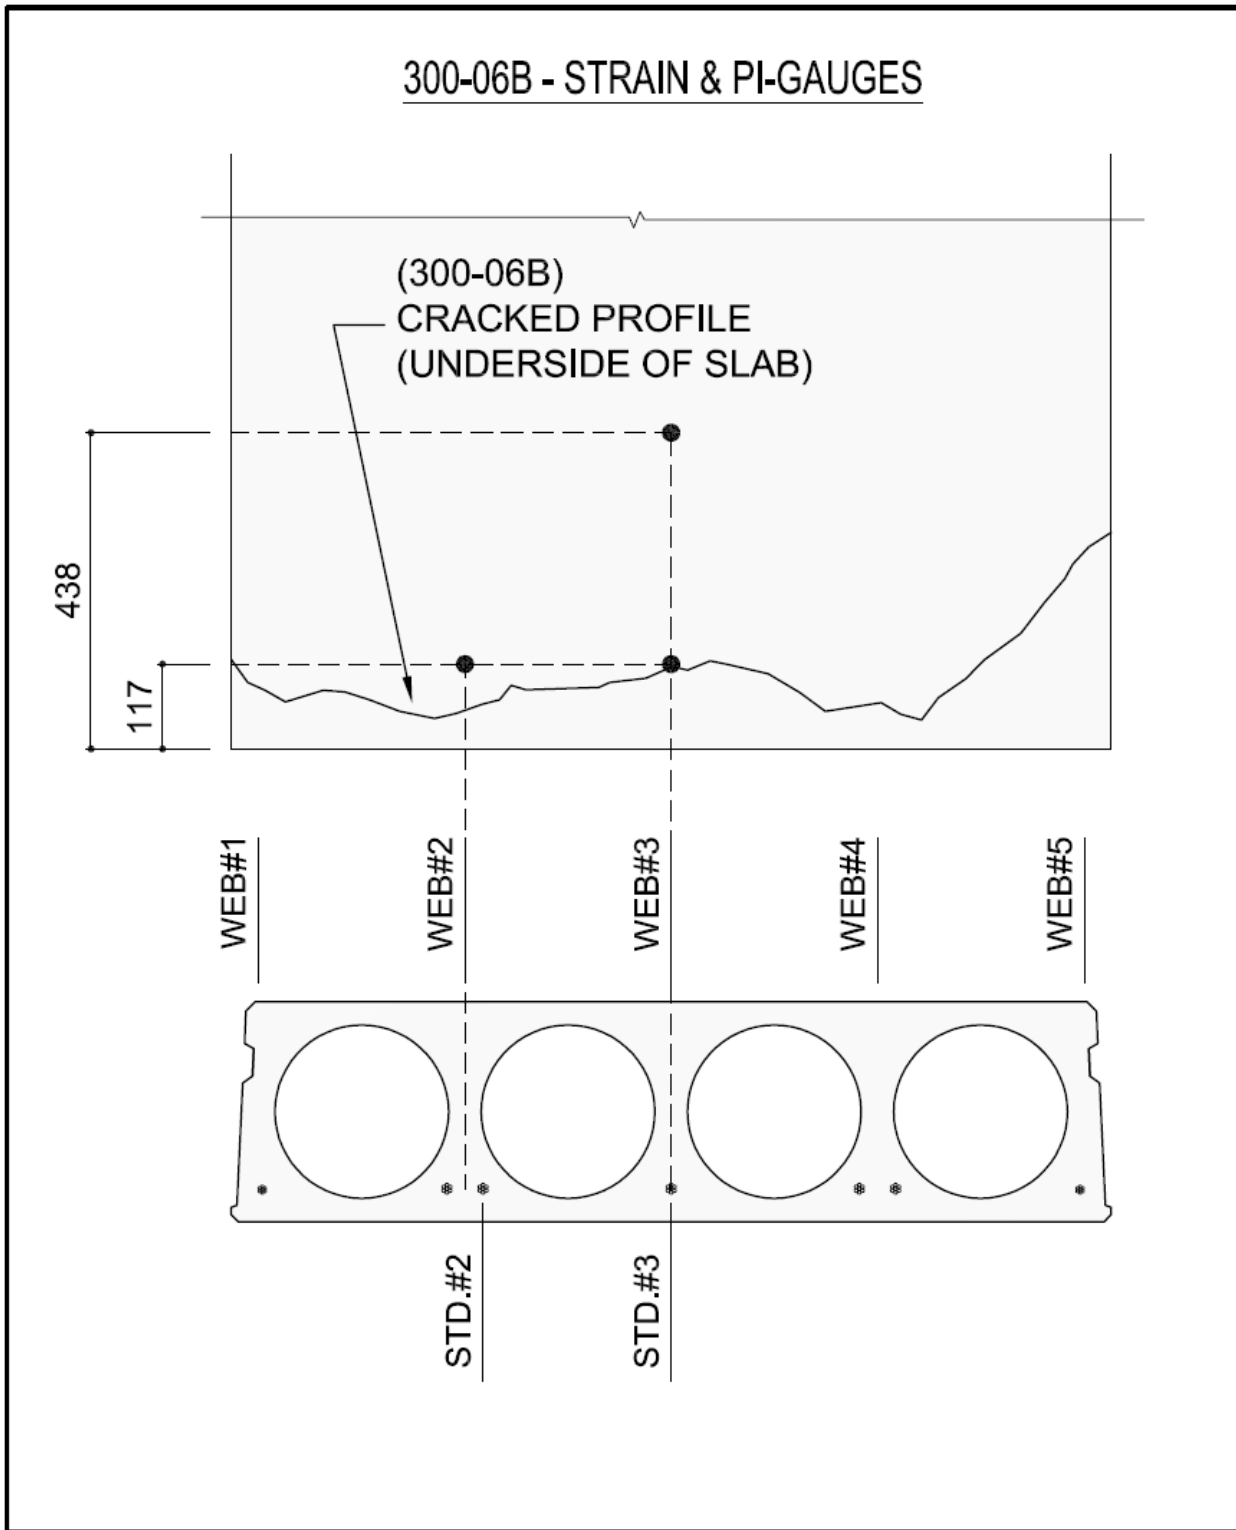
Plan View of Gauges and Crack Profile at Slab Underside (Slab 300-06B)
